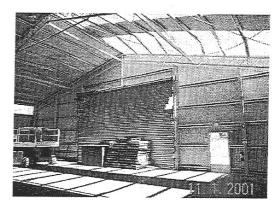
Debris damage to roller door allowed internal pressurisation and subsequent roof damage (Douglas Mawson Rd)
